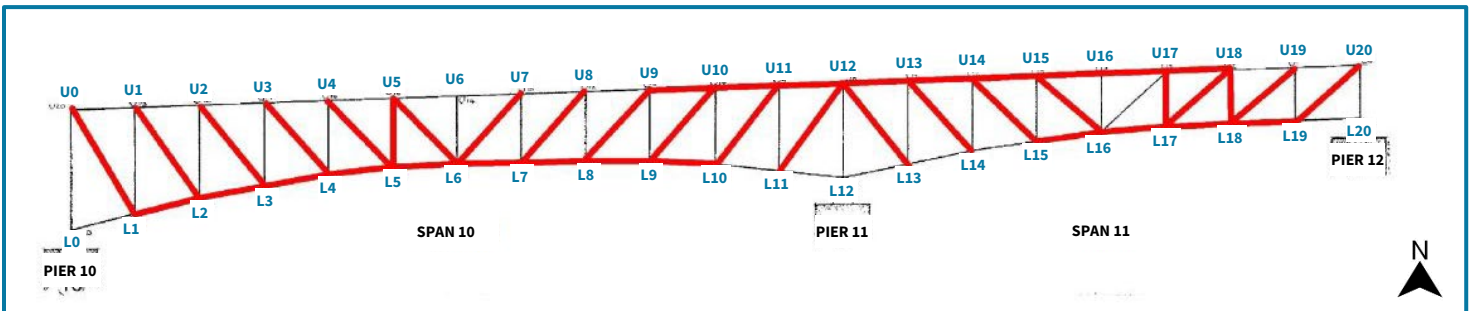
HAM-50-2180N Bridge Nomenclature (Truss Layout and NSTMs - Spans 10 to 11)
